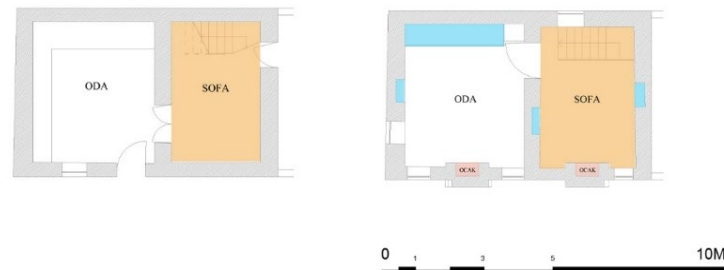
Plan type with “side sofa”; ground and first floor plans.
